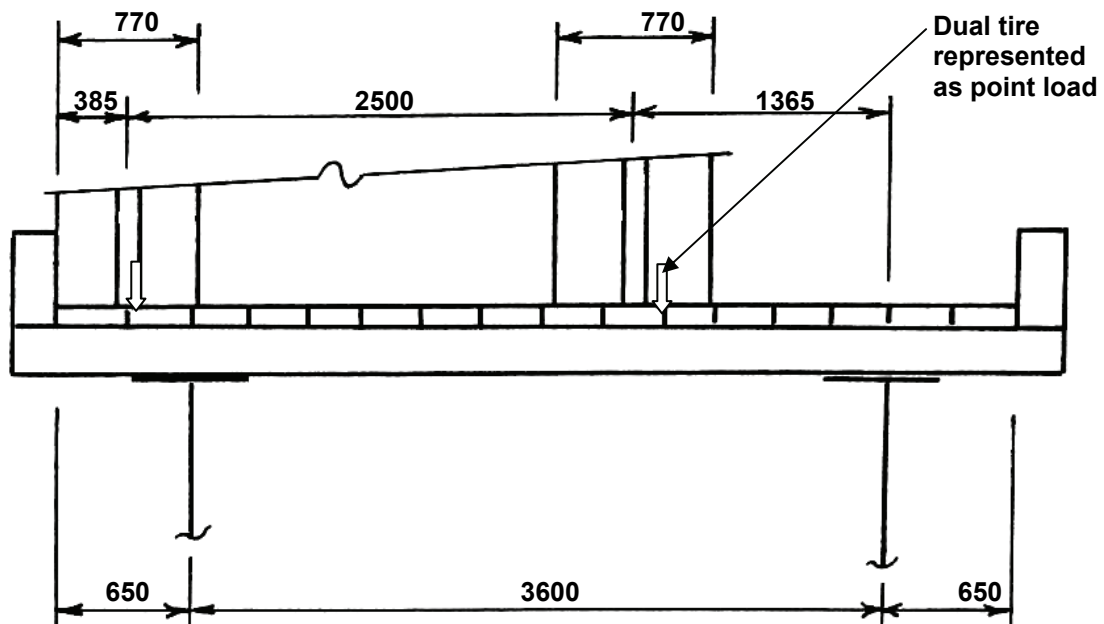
Transverse position of Heavy Off-highway Design Truck on timber deck on girders at a spacing of 3.6 m
